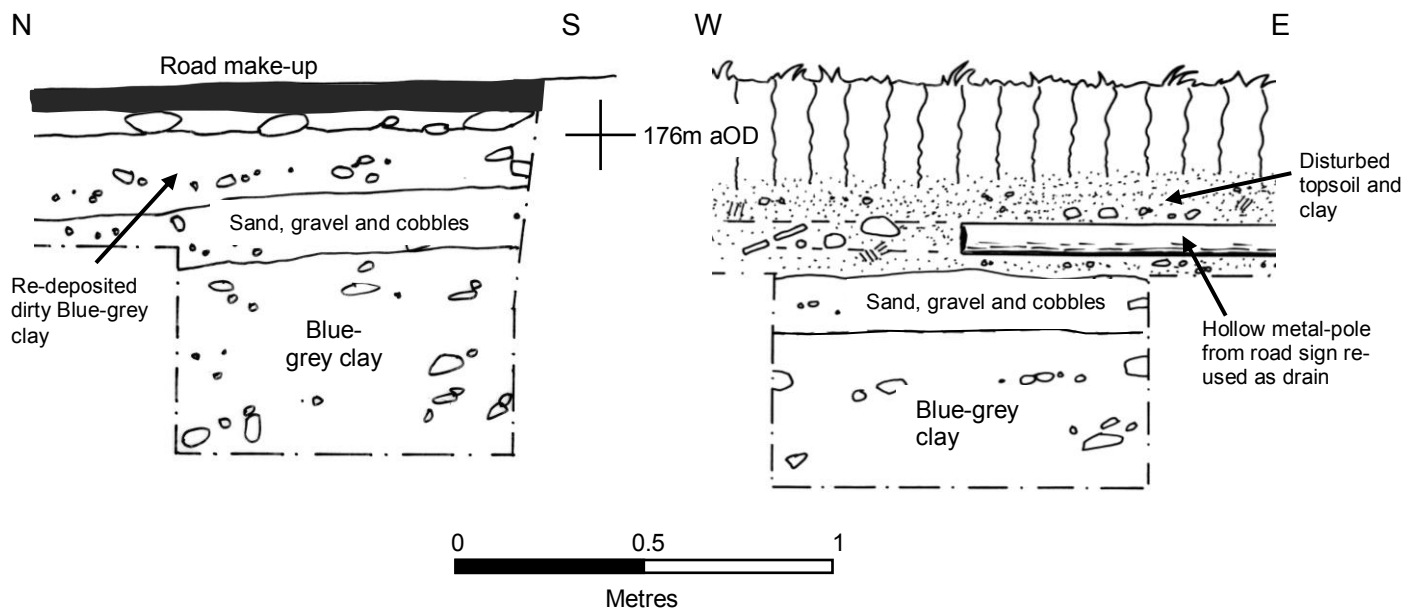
Sections of excavations for Chambers A South (left) and North (right).
